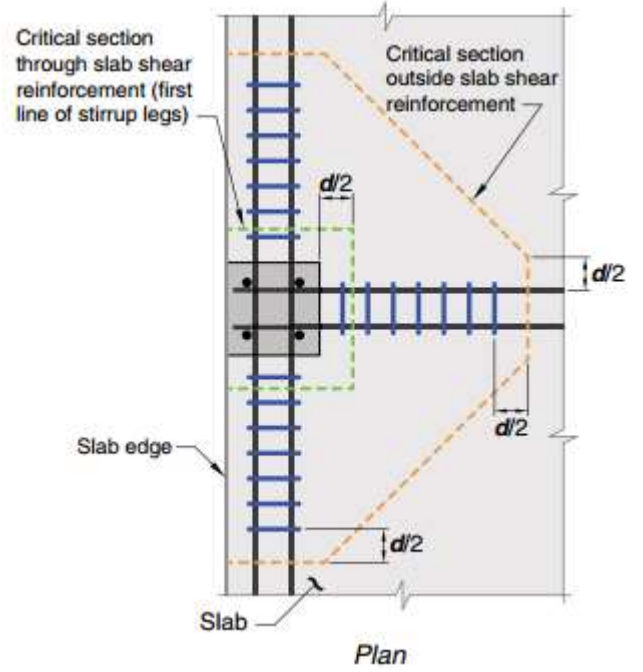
Critical sections for two-way shear in slab with shear reinforcement at edge column.
